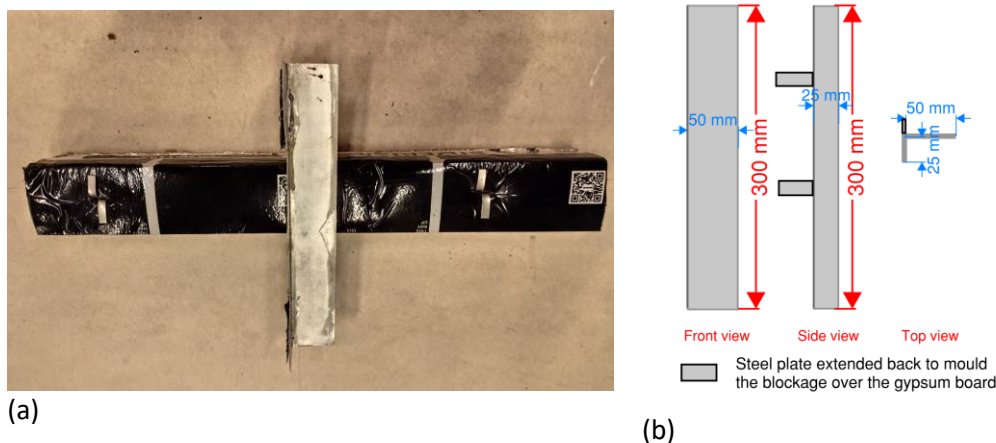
Installation of cavity barrier with L angle. (a) Experimental setup front view (b) Section drawing for the L steel angle
